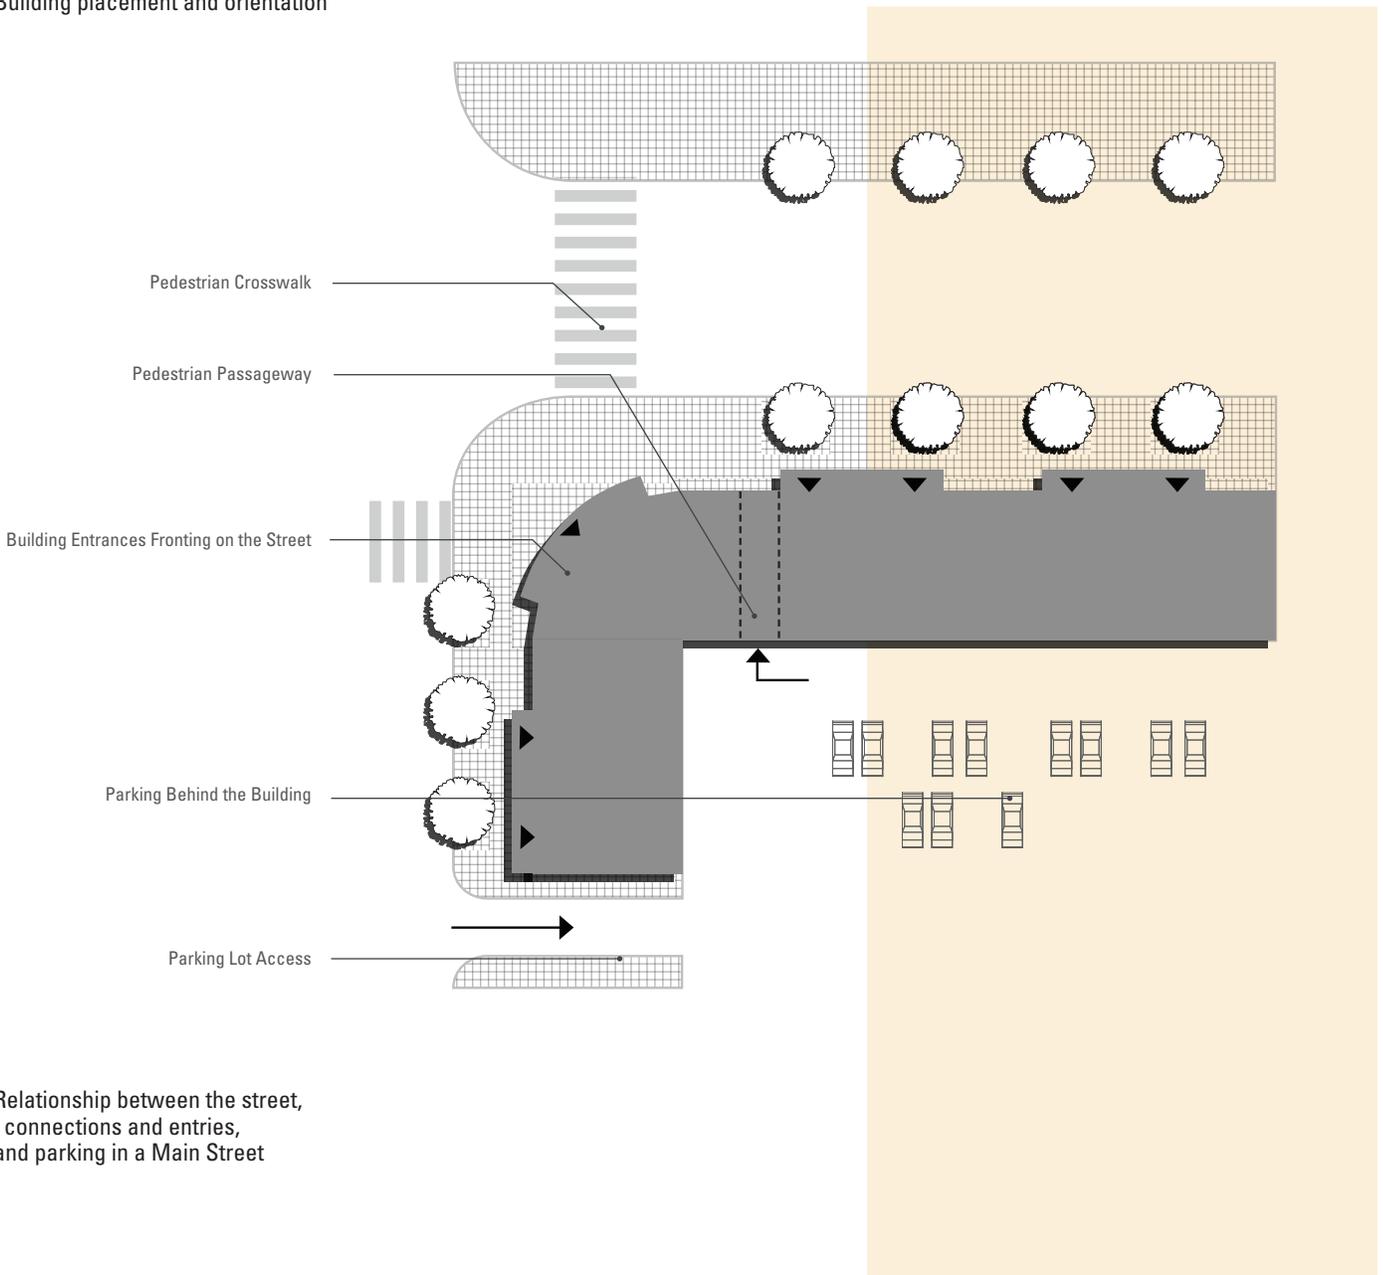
Relationship between the street, pedestrian connections and entries, buildings, and parking in a Main Street setting
